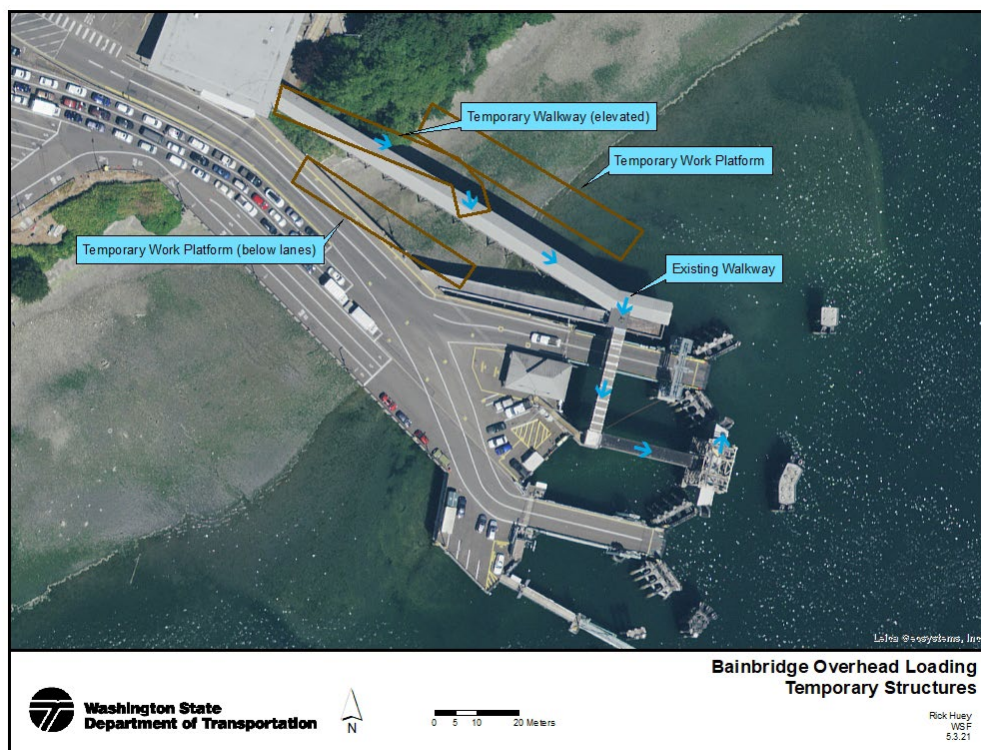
Bainbridge Overhead Loading Temporary Structures (not built)
